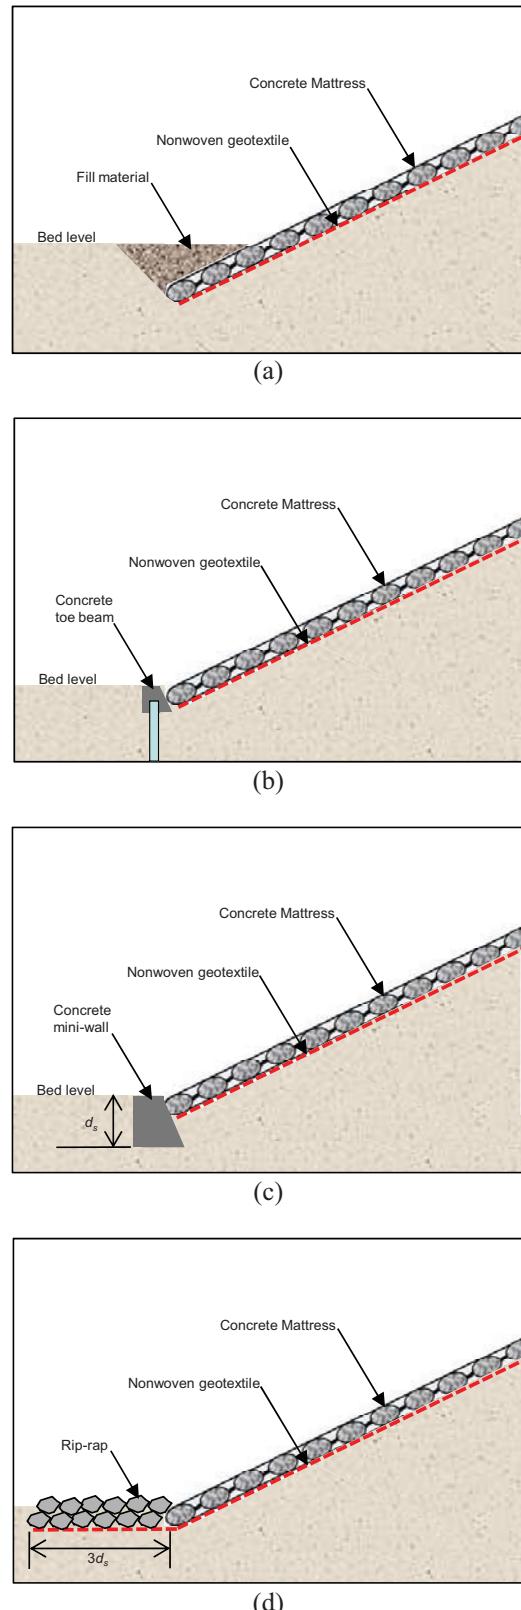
Toe protection details (a) buried toe (b) sheet piling (c) toe retaining structure (d) extension of cover layer along bed
